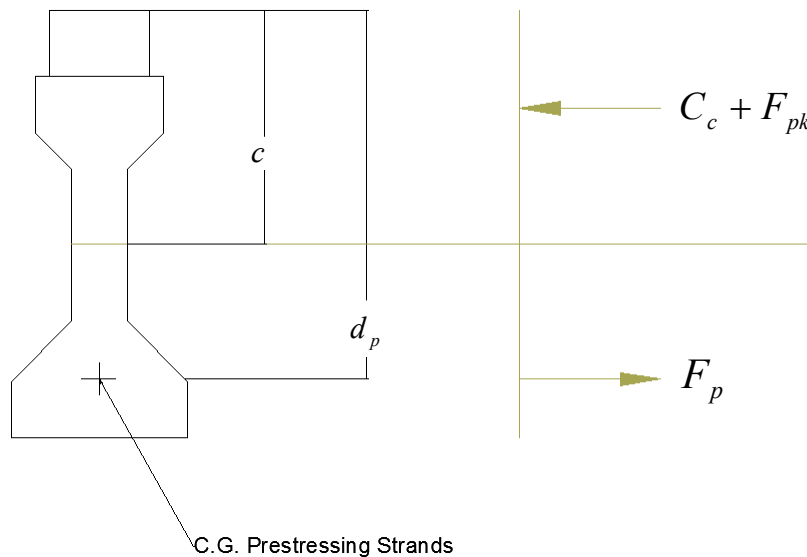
Force Equilibrium for Nominal Flexural Strength (Un-damaged Girder)
